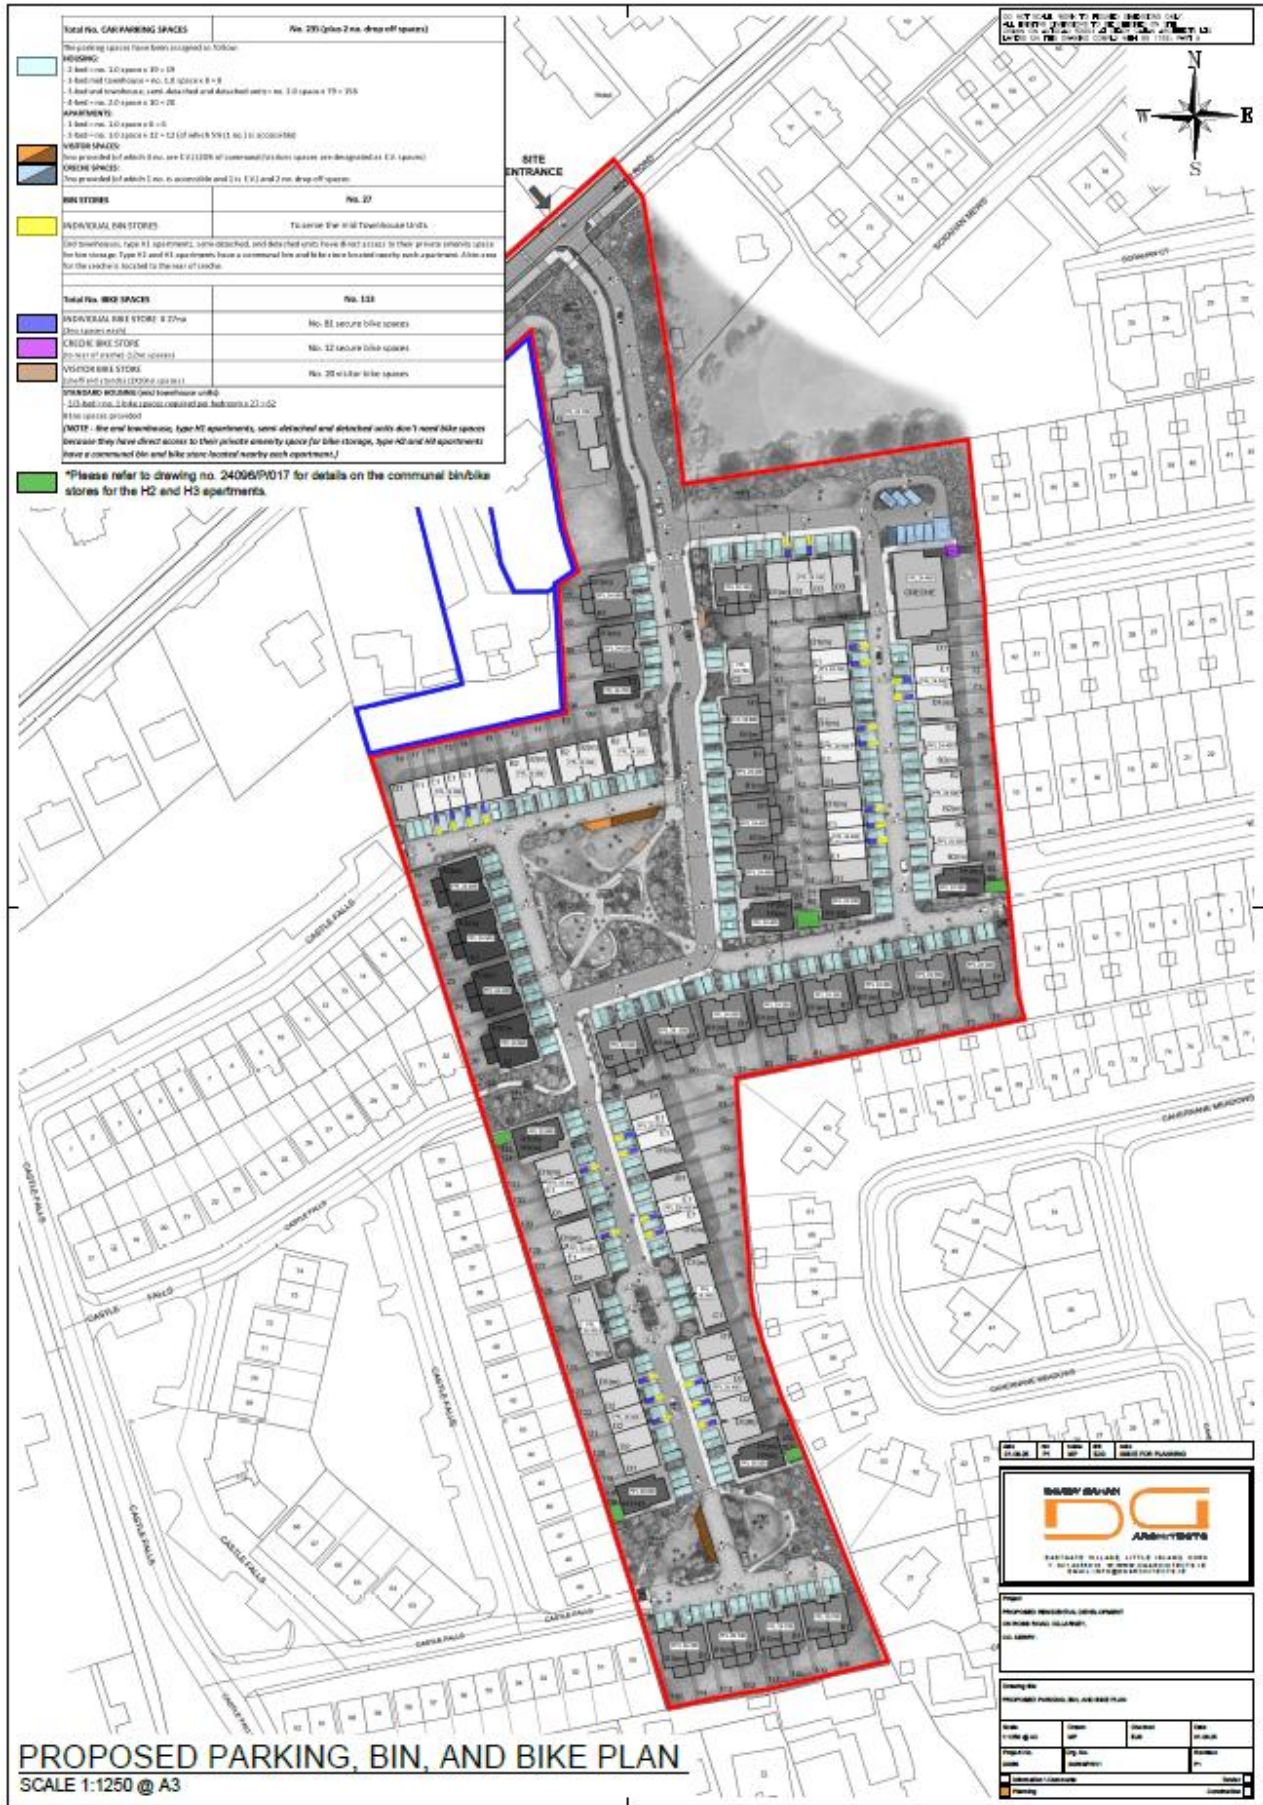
Site layout showing parking proposals (Credit: Deady Gahan Architects)
